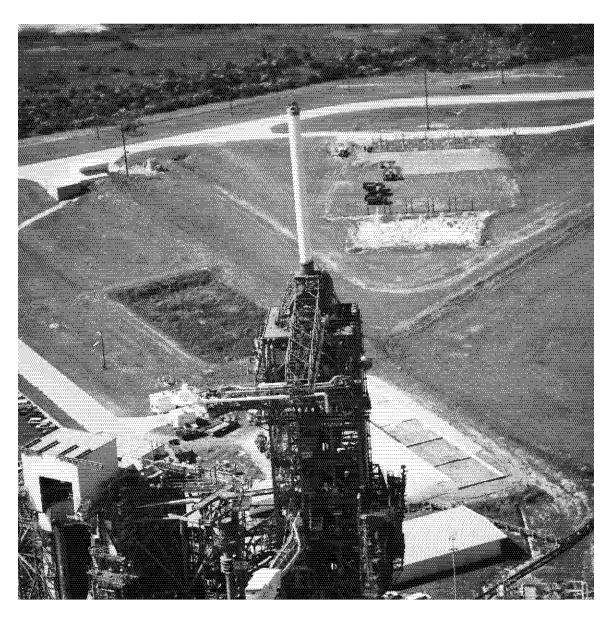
Construction of the Slidewire Termination Facility at LC39A, November 6, 1980. Source: John F. Kennedy Space Center Archives, 108-KSC-380C-3034 Frame 5.
